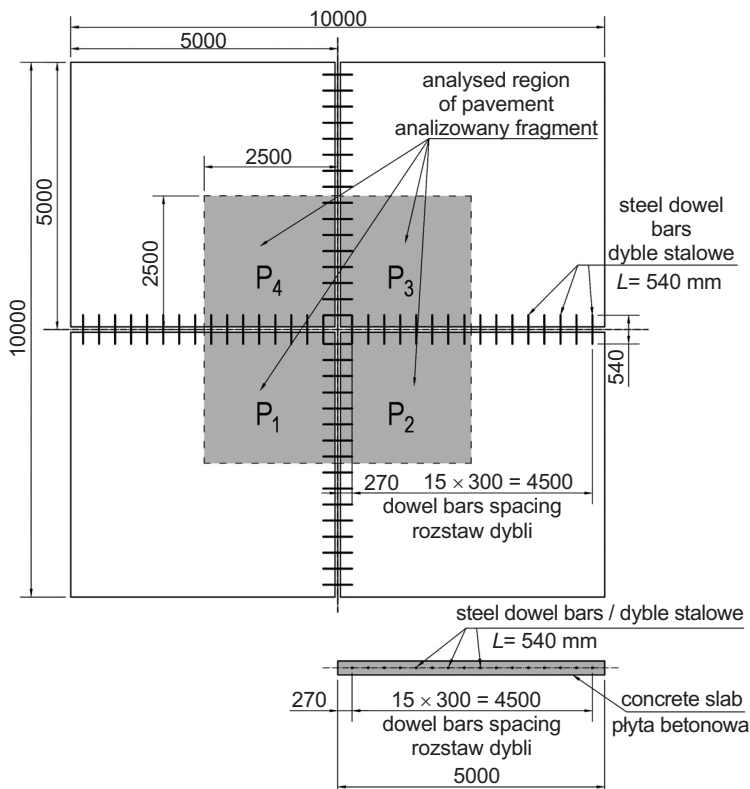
Top layer of concrete airport pavement; all dimensions are in mm, marked in grey is the analysed region of pavement
